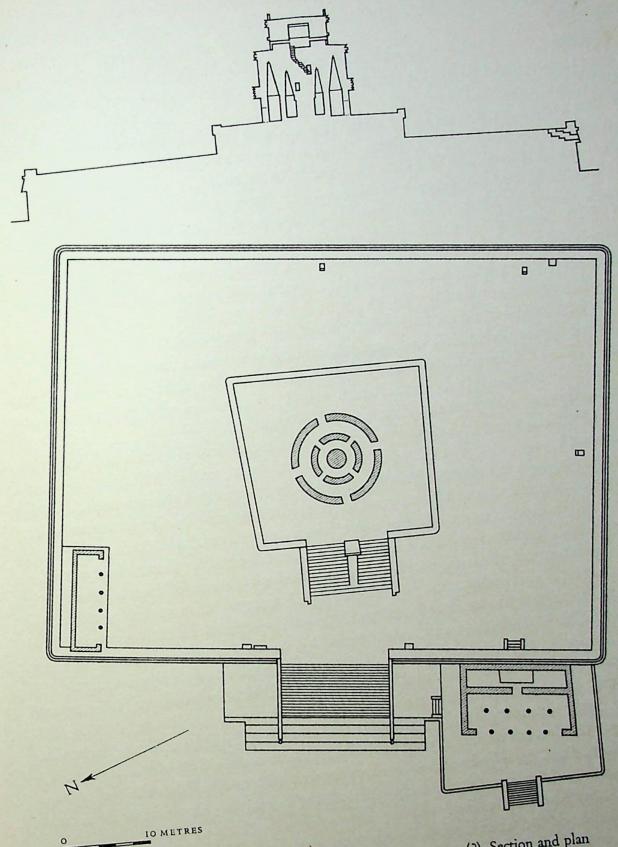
Chichén Itza, Caracol, eleventh century (?). Section and plan
